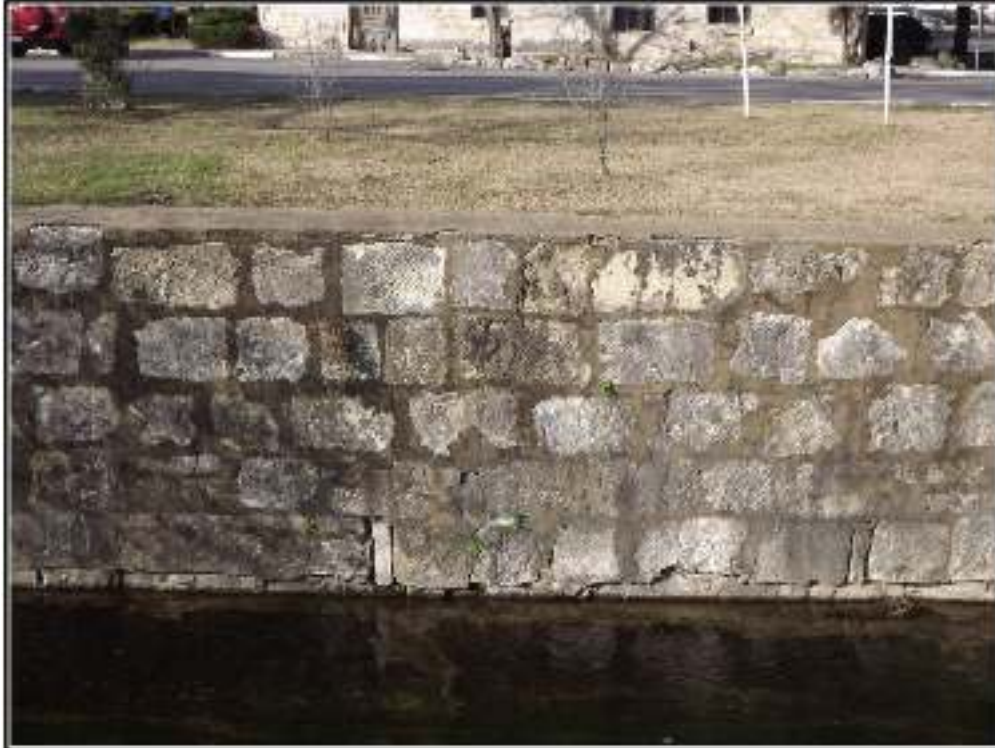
Stone wall along west bank of creek, likely WPA-era construction.
